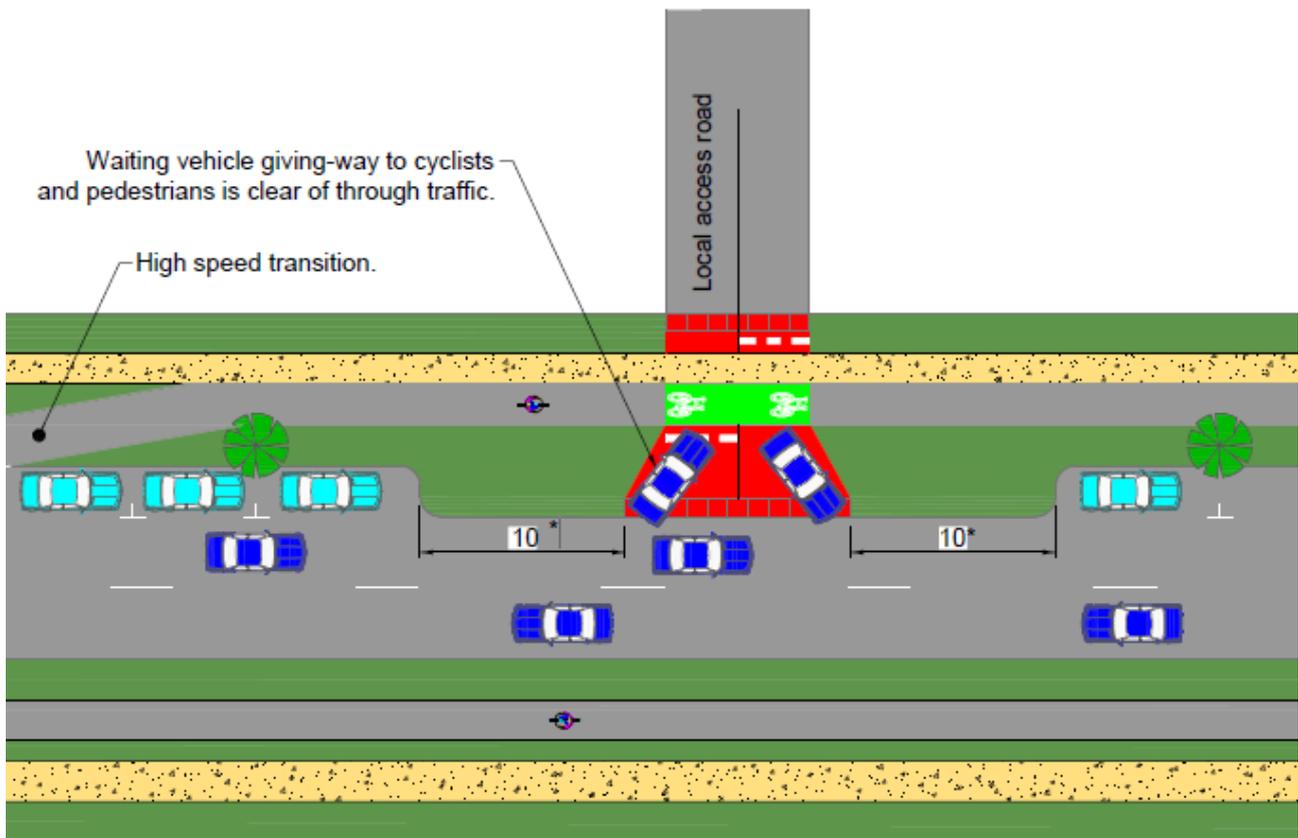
One-Way Cycle Track and Footpath at Side Road
